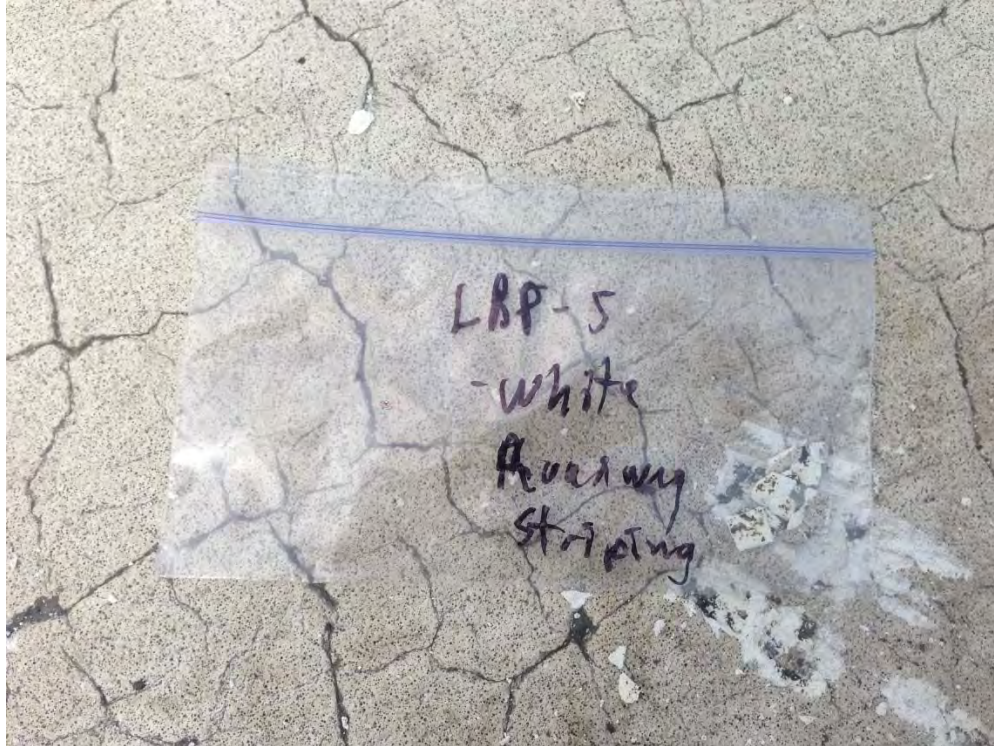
Sample LBP-05 taken from white roadway striping along the northbound side of the bridge
